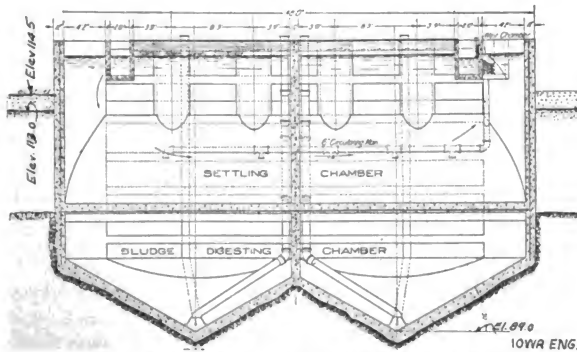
B. Detail Section of Main Settling Tank Section on B-B
